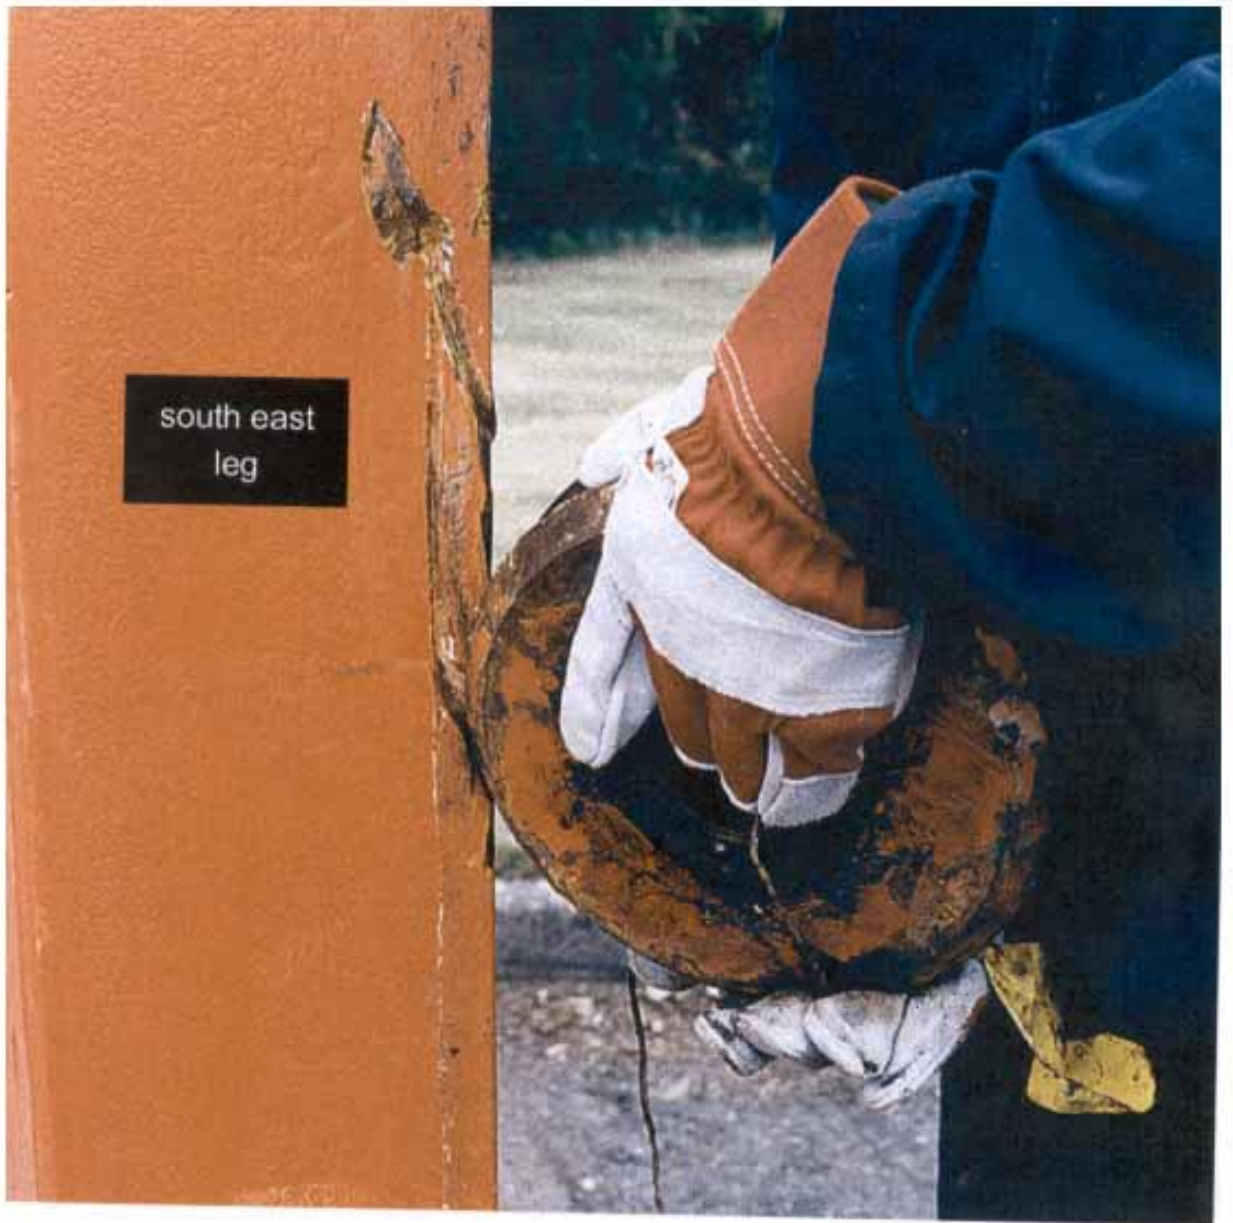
Guide Wheel being offered up to gouge marks on SE leg of mast section
